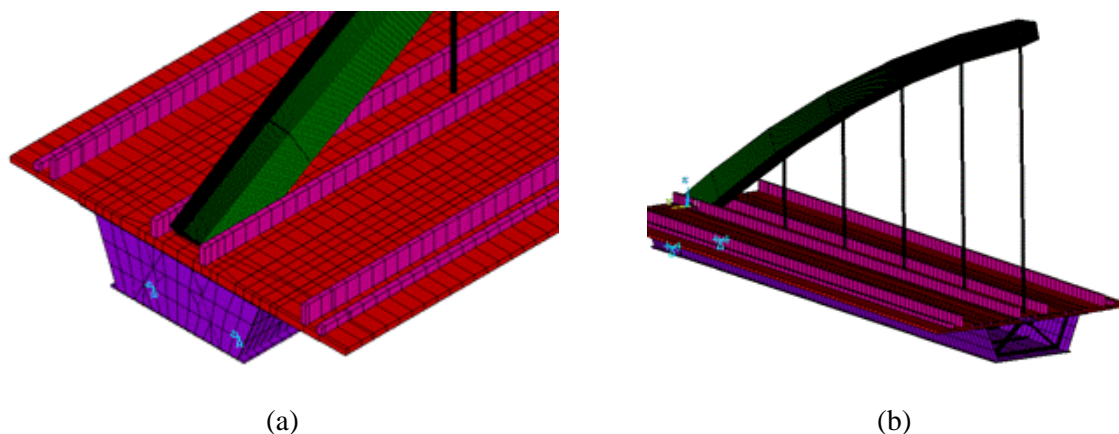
Numerical model of the bridge: (a) deck and arch's ending point and (b) cut view of the deck and arch.
